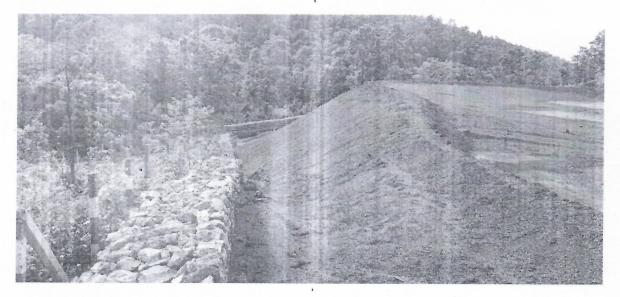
Showing Retaining wall & garland drain around OB Dumps
